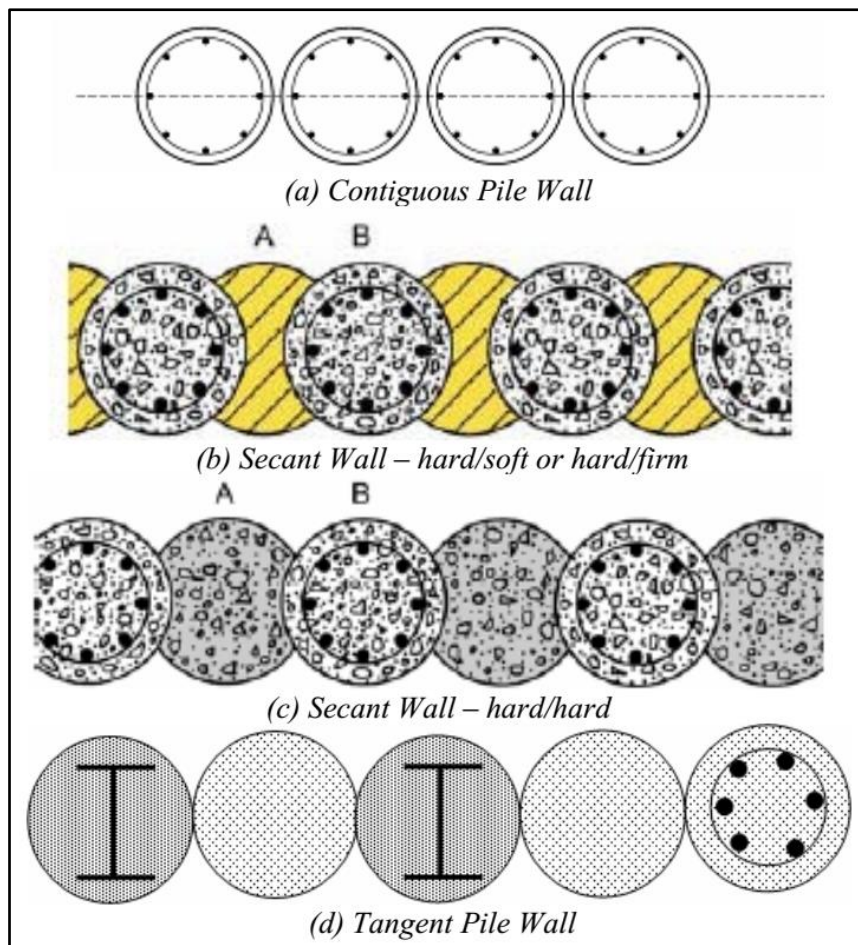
Types of Pile Wall (Where A Primary Pile- Unreinforced and B Secondary Pile-Reinforced Piles) (Venkata Ramasubbarao Godavarthi, 2011)
